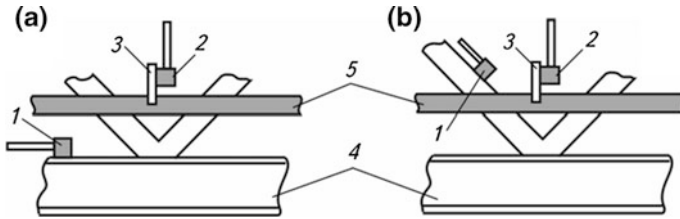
Location of the AET under the loading of span 0–1 (a) and spans 1–2 and 2–3 (b): 1 is AET No. 1; 2 is AET No. 2; 3 is a waveguide; 4 is a lower girder boom; 5 is a reinforced concrete plate of the bridge roadway
